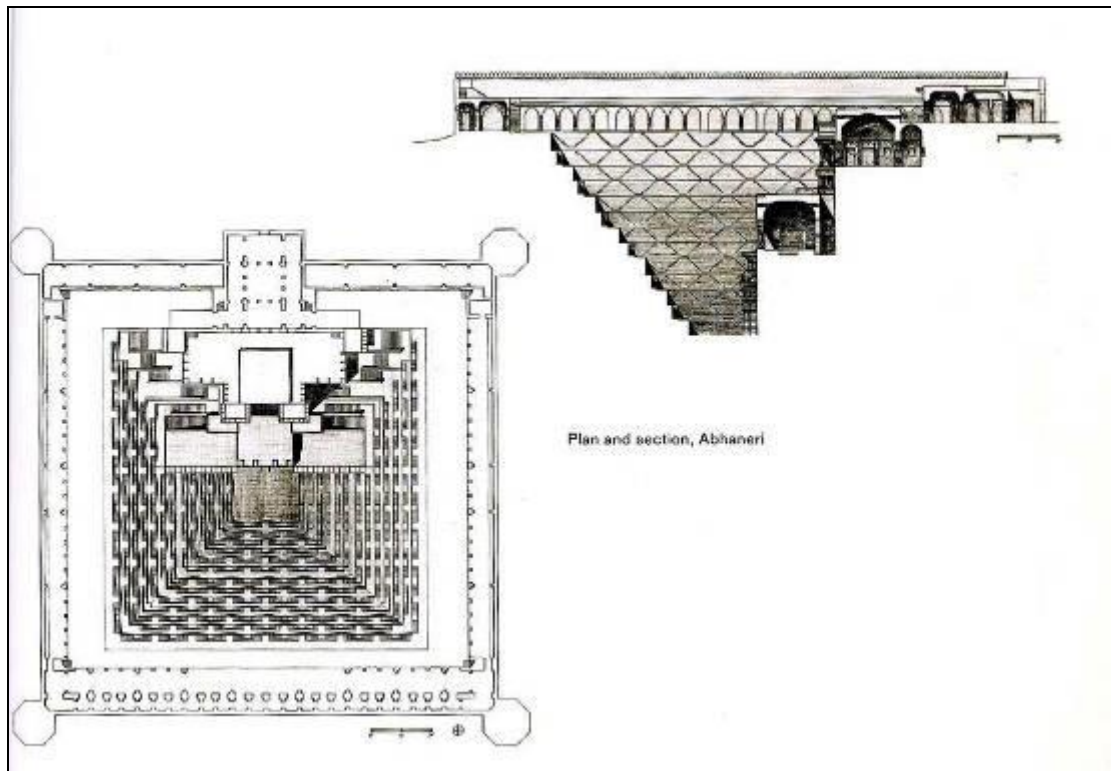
Plan and section, Abhaneri, Chand Baori, India<sup>1147</sup>.
